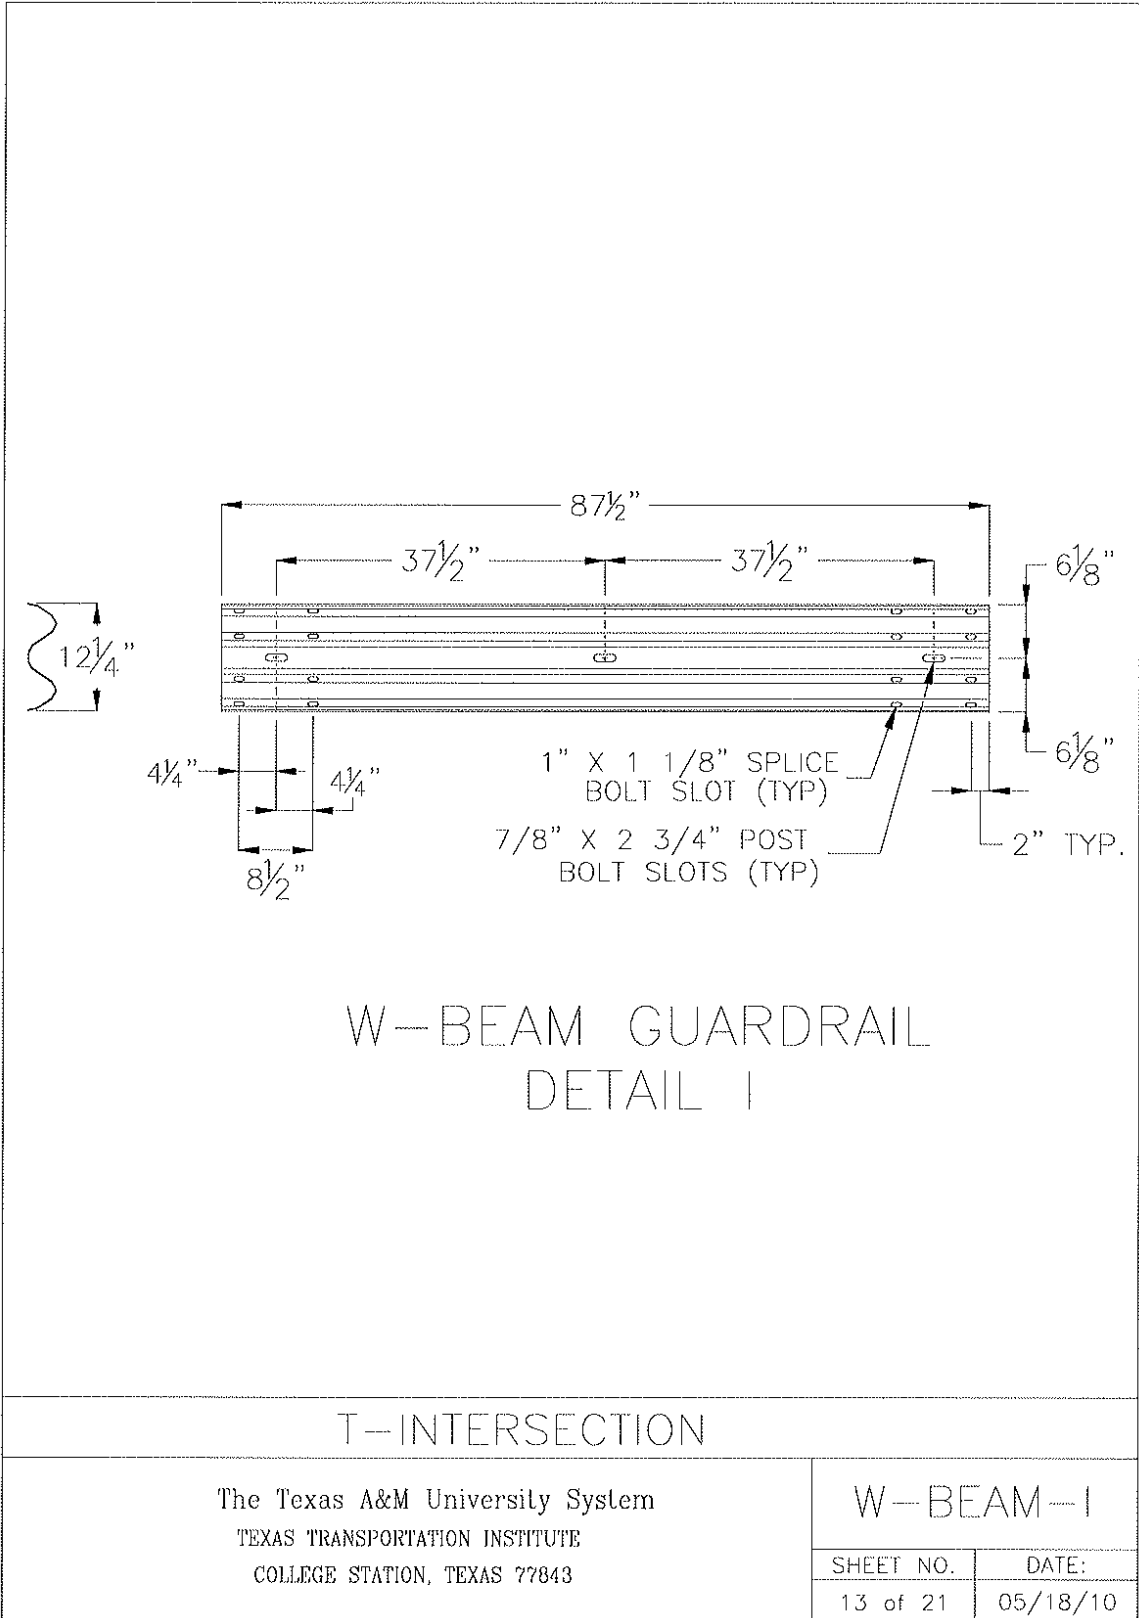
Rail Punch Details for W-Beam Near Transition [27]
